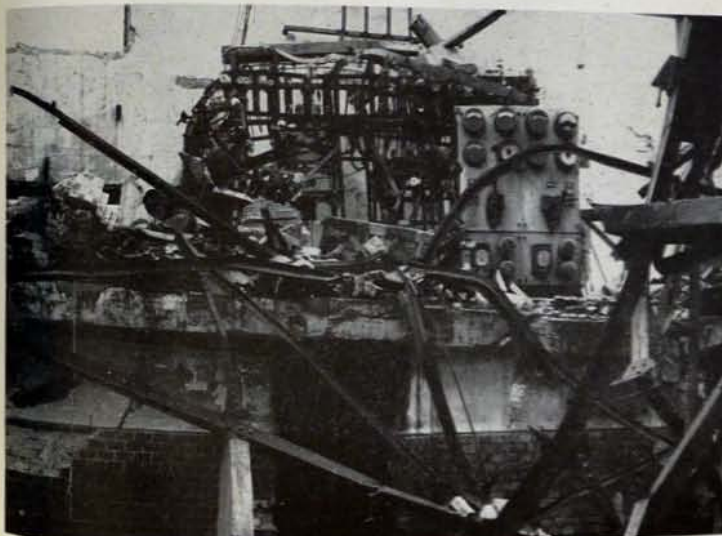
6,700 feet from GZ. Group 39. East end of Turbine room. Damage to roof truss.
